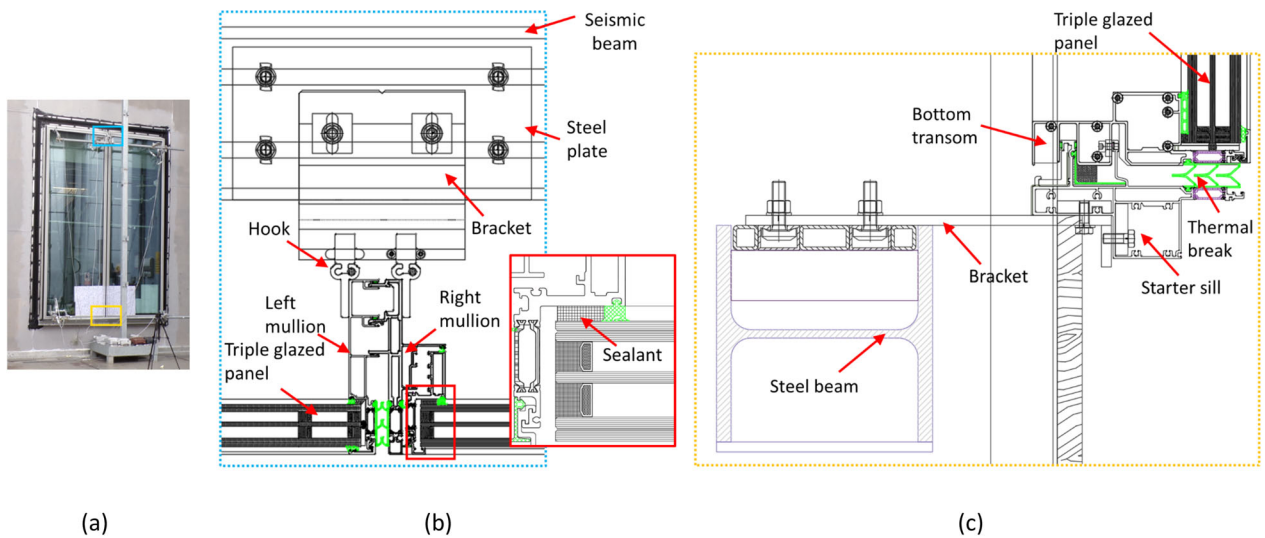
Connection detailing adopted for the façade configurations: a photo of Type 1; b connection of the unit to the upper seismic beam; c connection of the unit to the bottom beam
